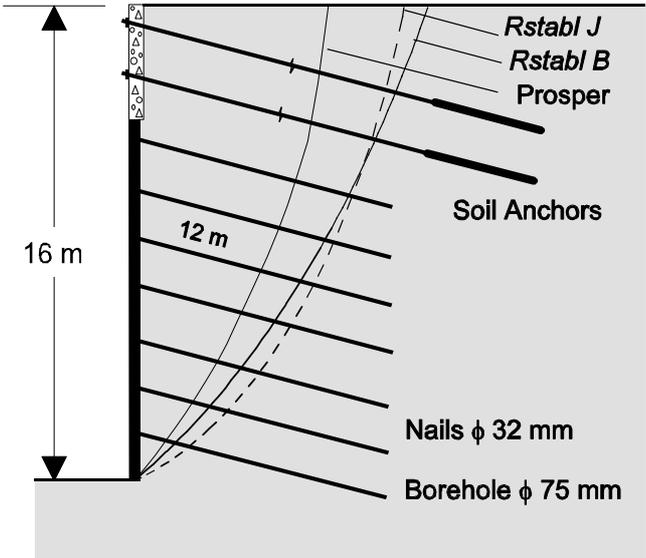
Mixed soil nailing structure proposed for an excavation in medium sandy-silt
